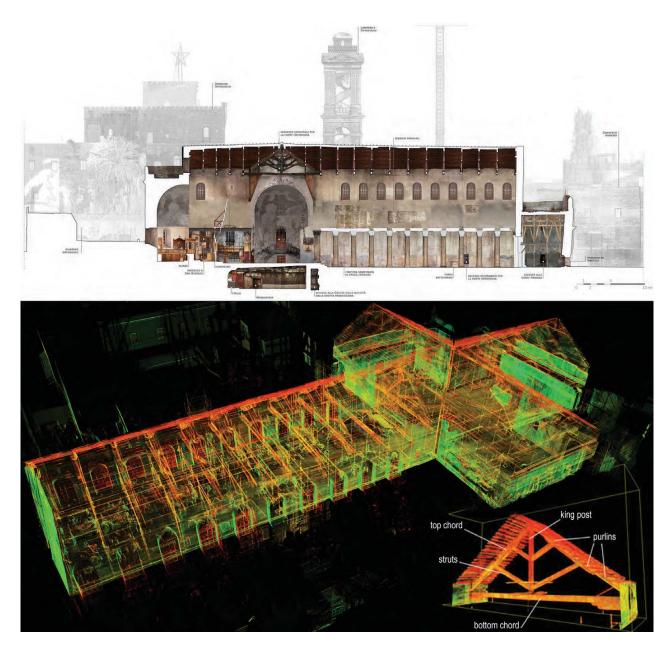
Above: Longitudinal section of the Nativity Church with application of real photomaps to analyse damage. Below: detailed view from the point cloud of the wooden roof structure of the Nativity Church with a zoom on atypical timber truss.
